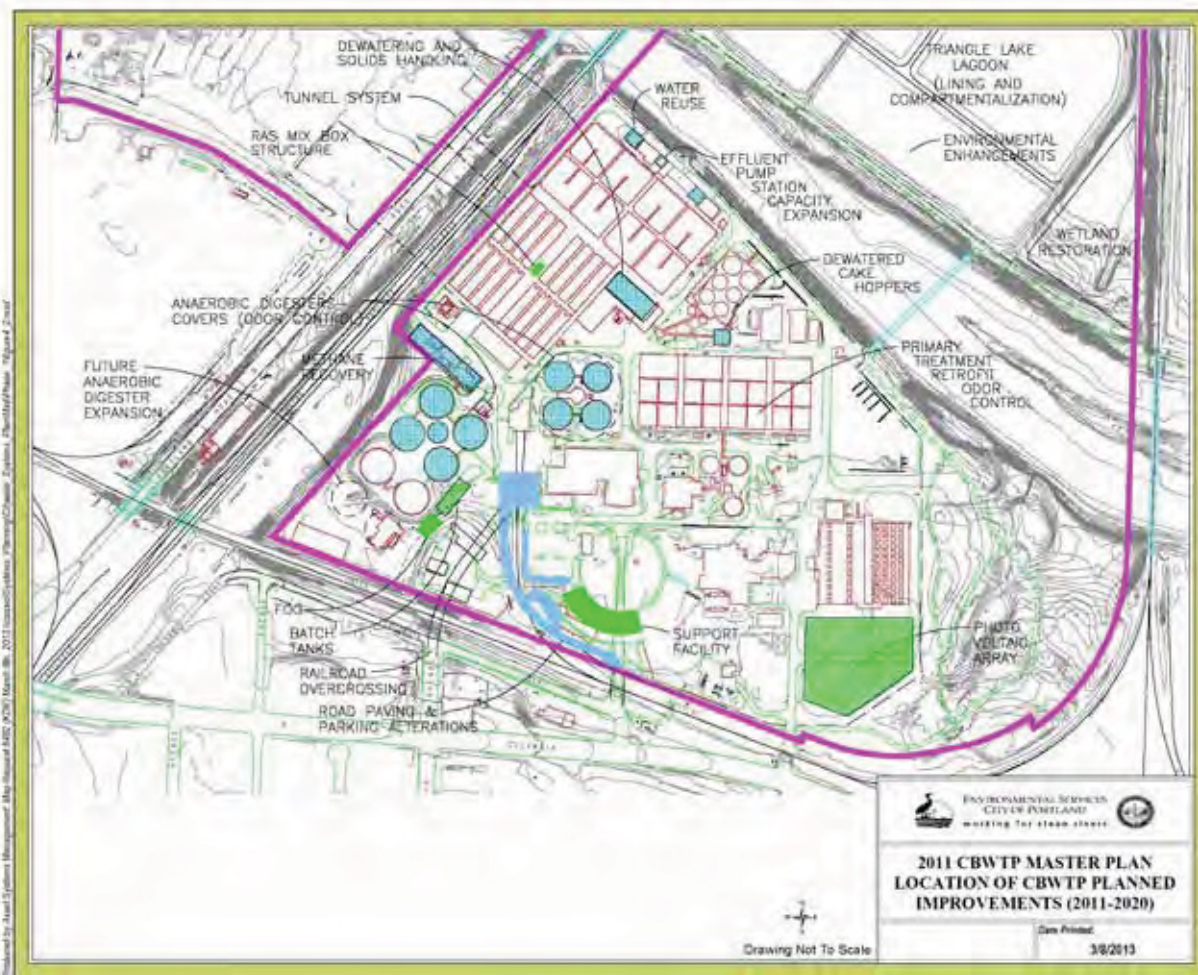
Columbia Boulevard Wastewater Treatment Plant Master Plan
